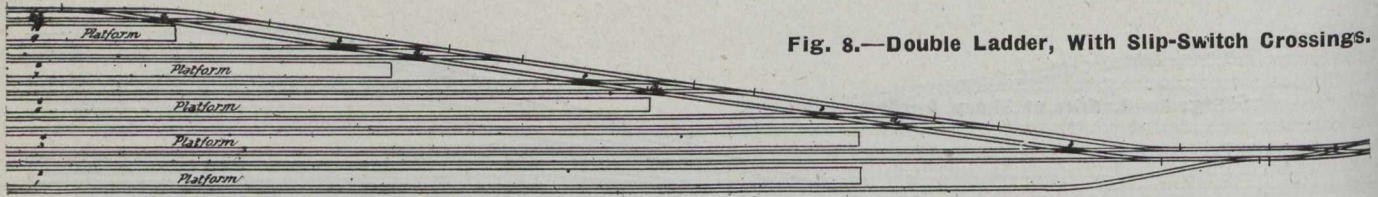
Double Ladder, With Slip-Switch Crossings.
